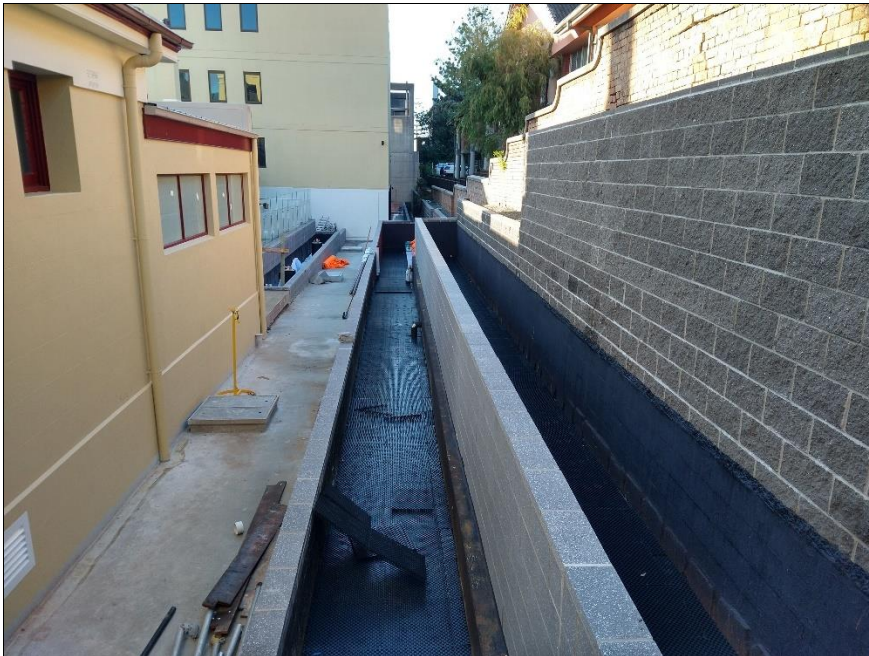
Concrete footpath (capping) beneath pre crushed granite path and garden beds with geogrid matting over concrete to rear of central building (13 July 2021)
